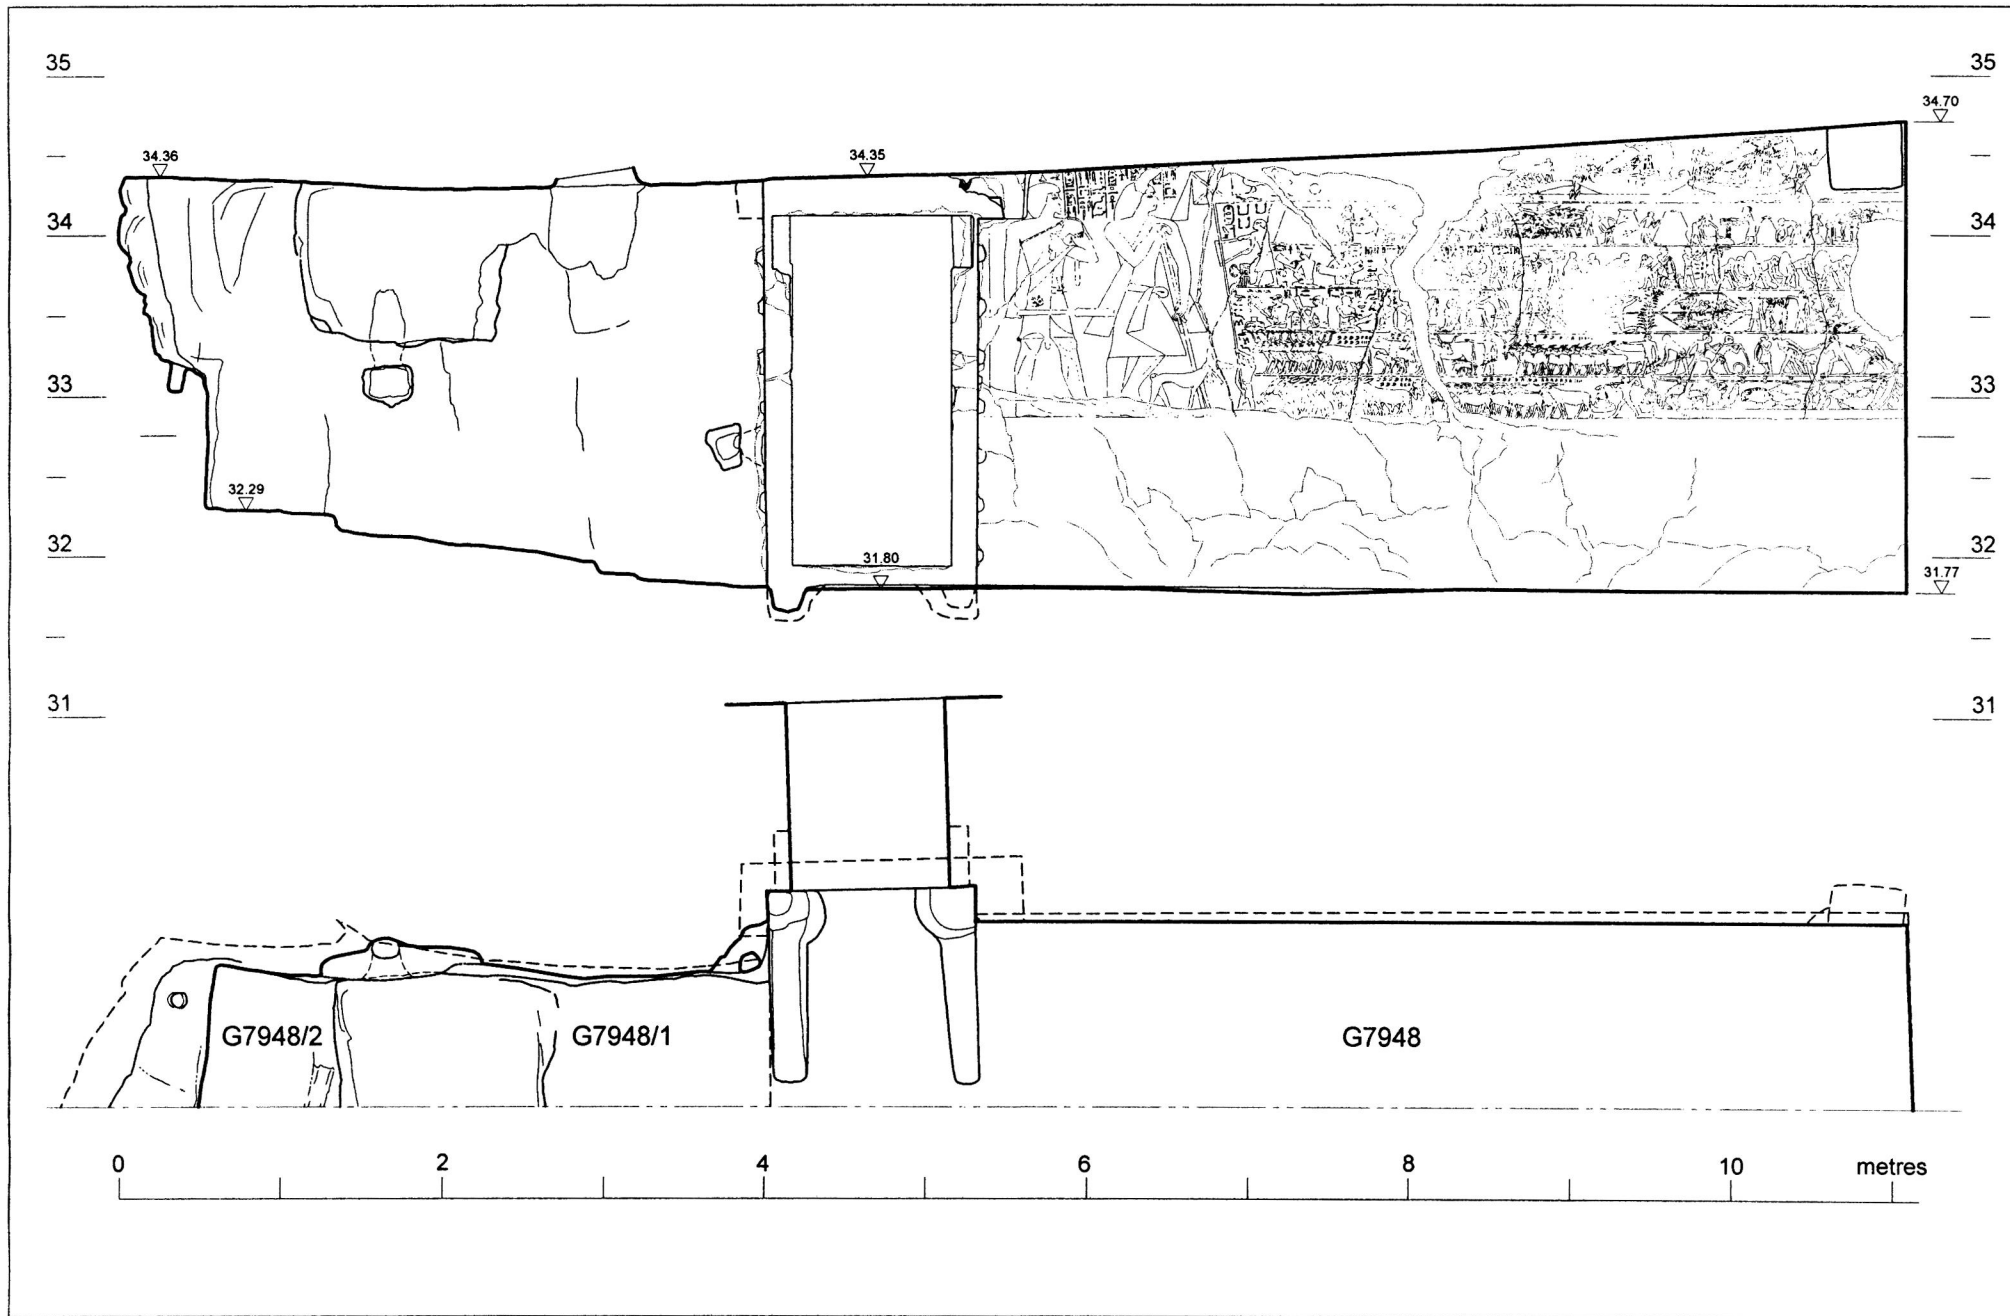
Tomb of Khafraankh. Eastern wall, section and plan
